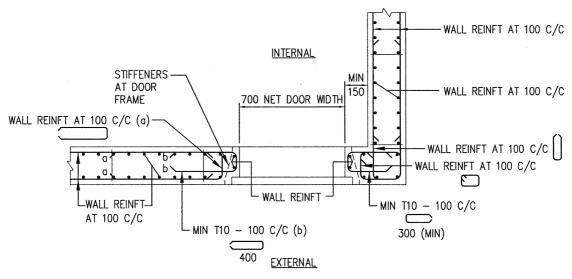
(g) PLAN OF HS WALL REINFORCEMENT DETAILS NEAR HS DOOR
